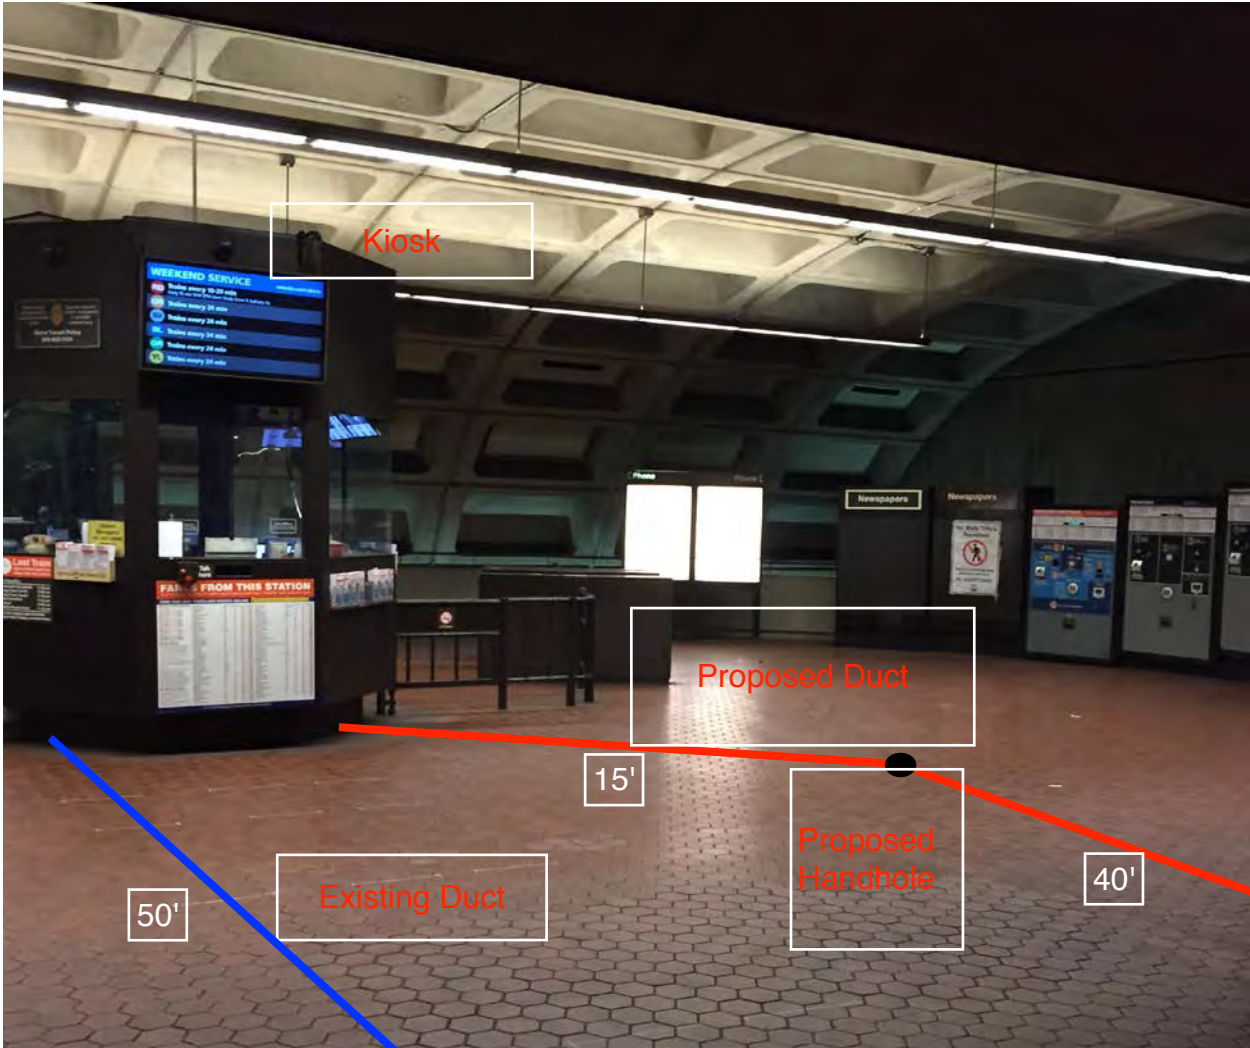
Existing and Proposed Duct/Conduit on mezzanine floor
